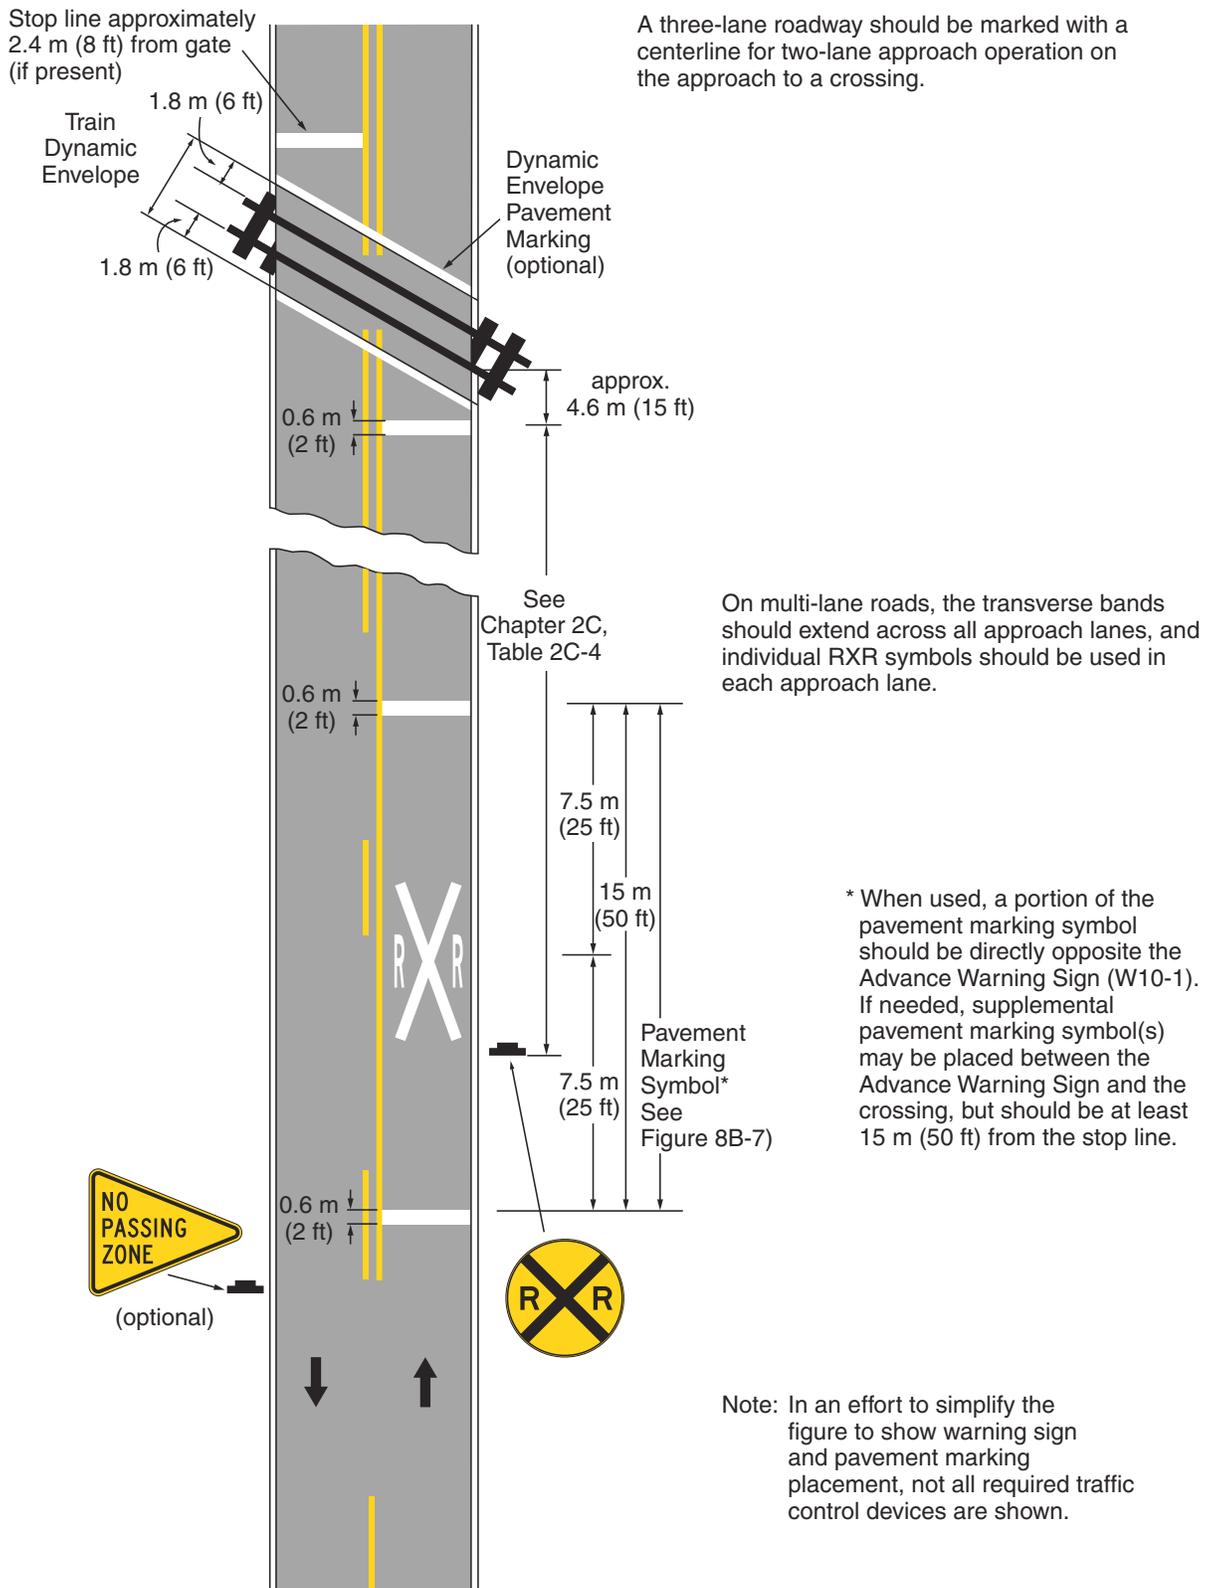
Example of Placement of Warning Signs and Pavement Markings at Highway-Rail Grade Crossings
